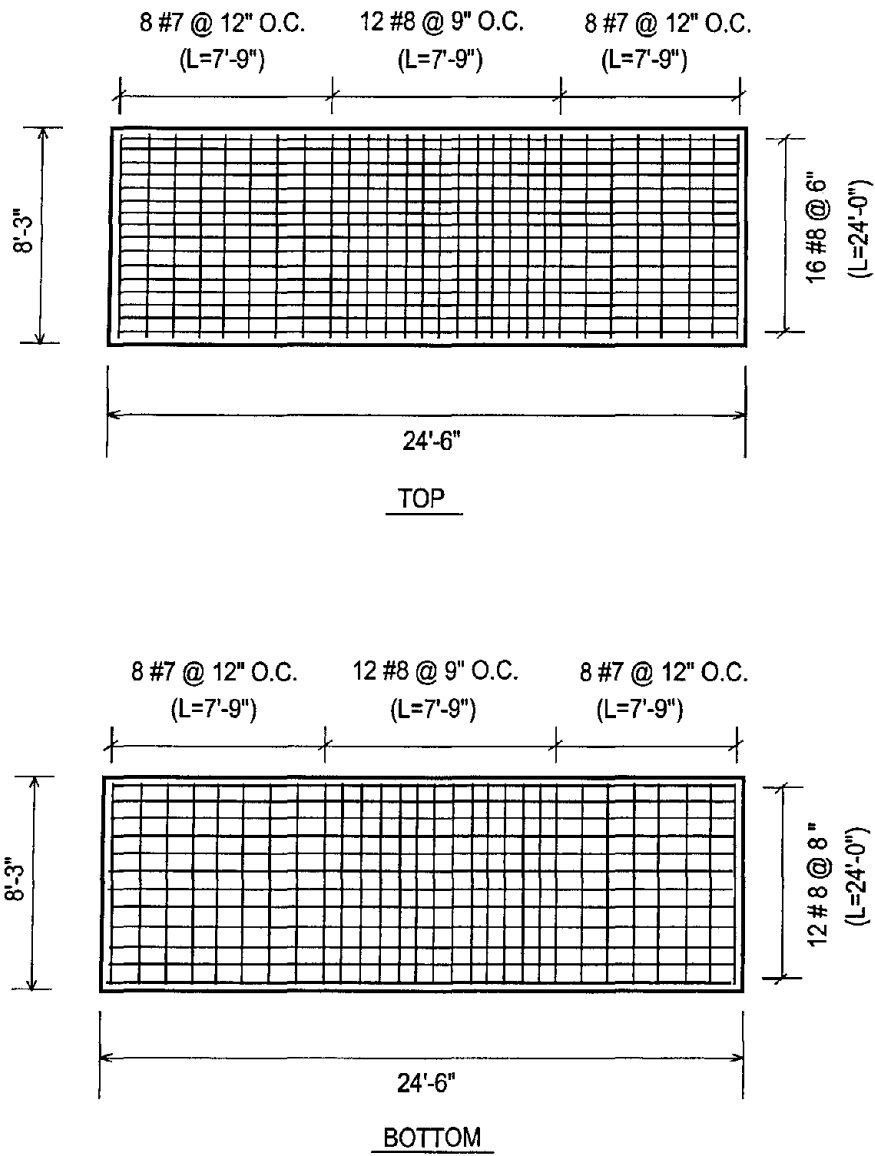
Reinforcement details for load frame footings (1'=305 mm, 1''=25.4 mm)
